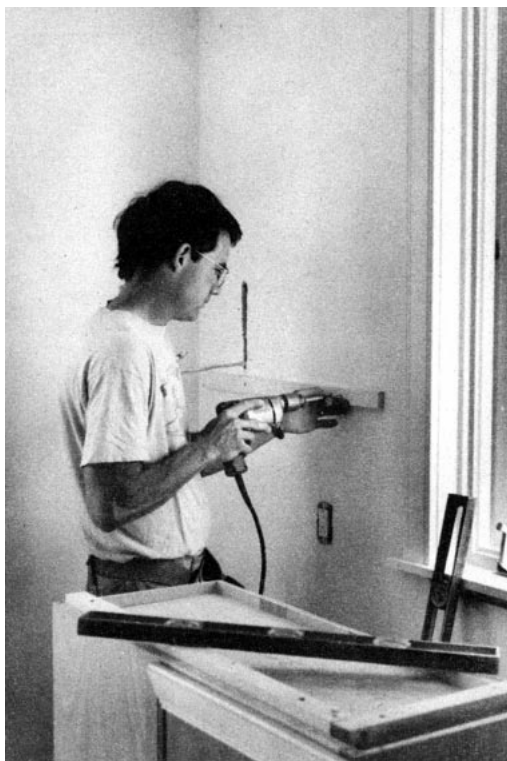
Starting in the corner, the author fastens a temporary ledger to the wall to support the first cabinet, a blind corner cabinet.
